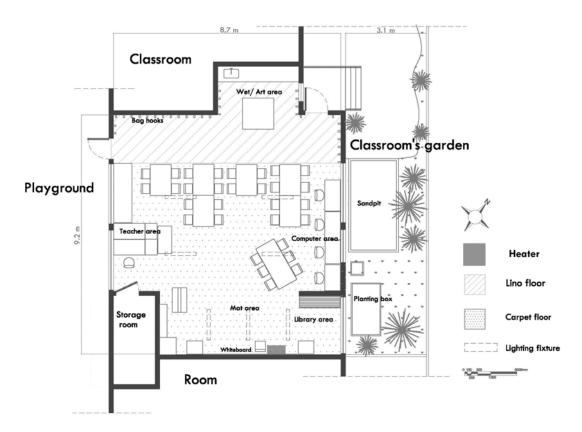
THORNDON CLASSROOM'S FLOOR PLAN.
